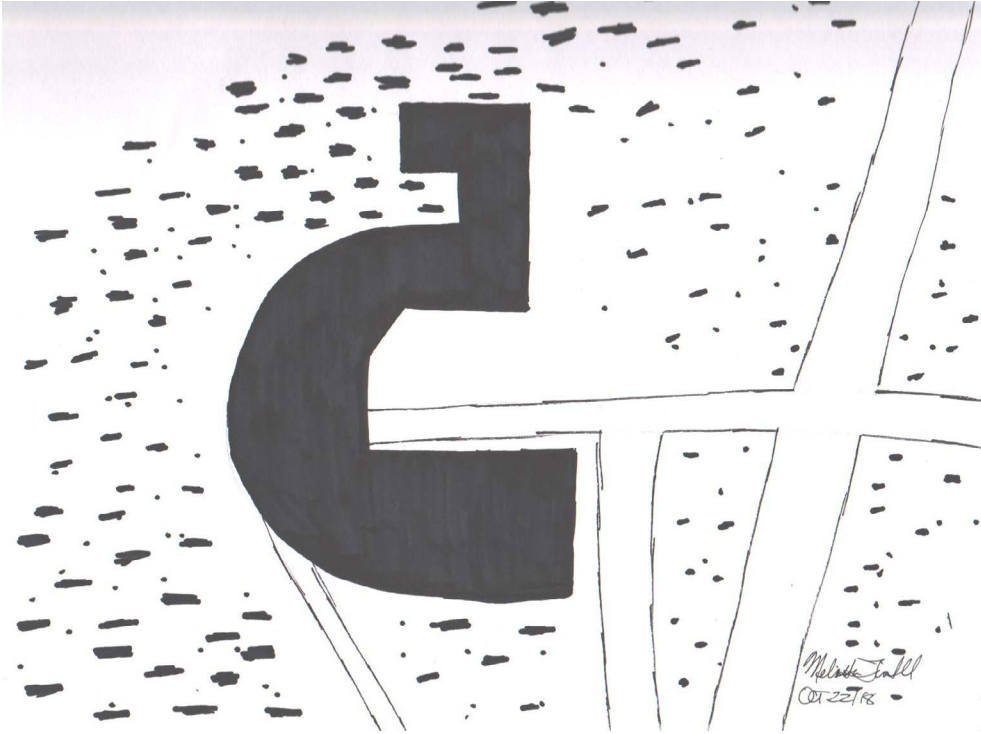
Sage House's site plan. Sketch by author - October 22, 2018.
